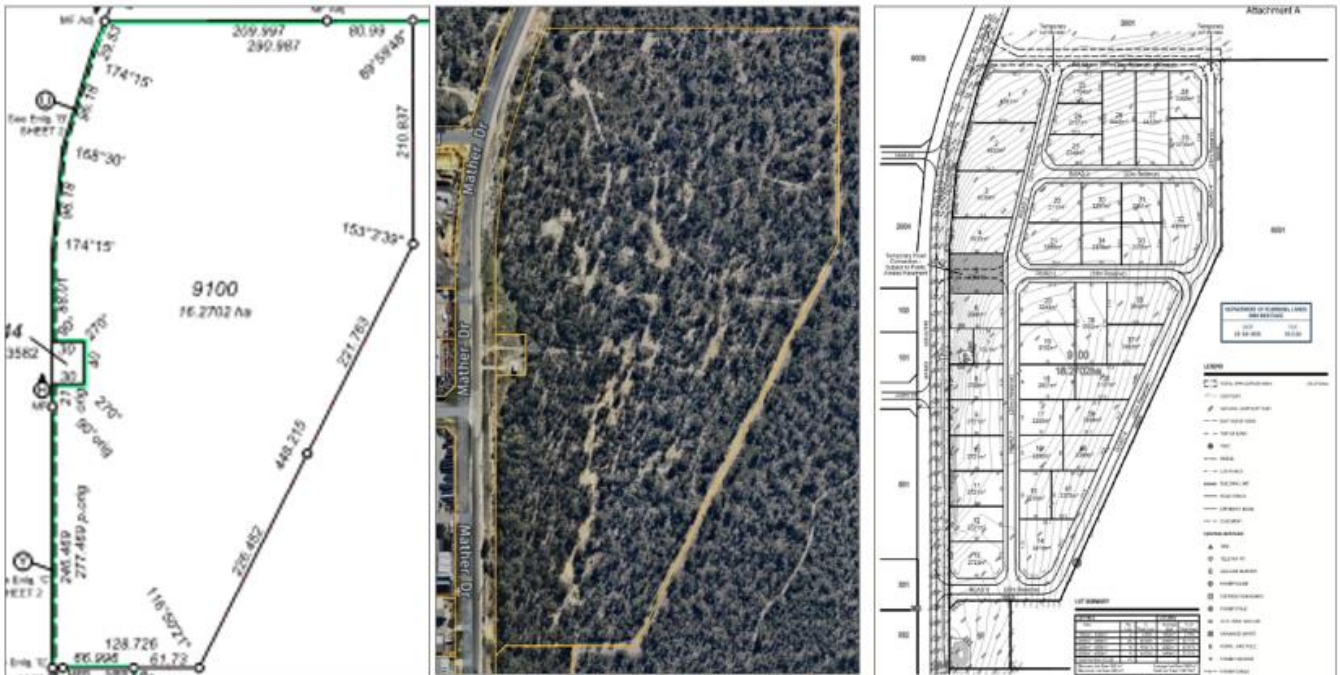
Lot 9100 illustrated on the site plan (left), current status (centre) and approved subdivision plan (right)
